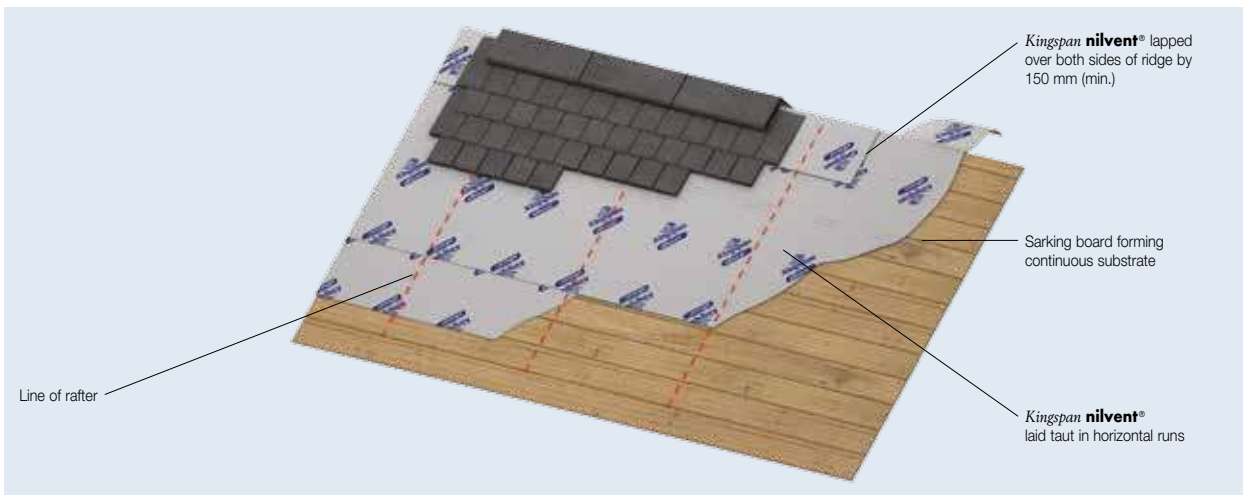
Ridge – Fully Supported Horizontal Installation with Natural Slates
